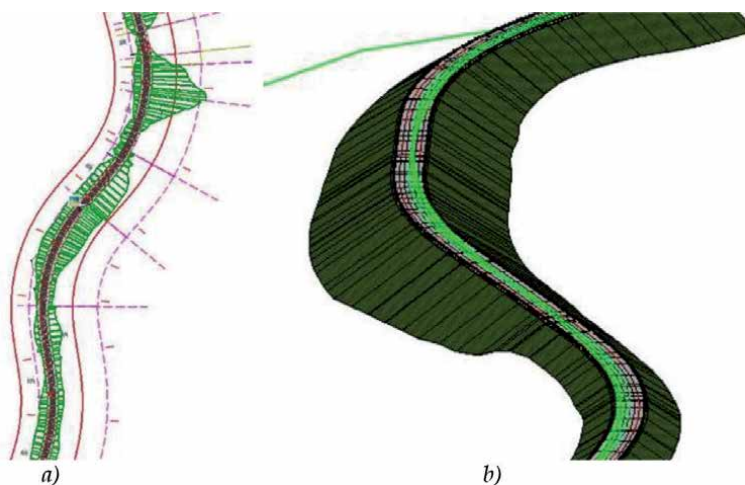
Modeling corridor. (a) Plan view, (b) 3D view.
